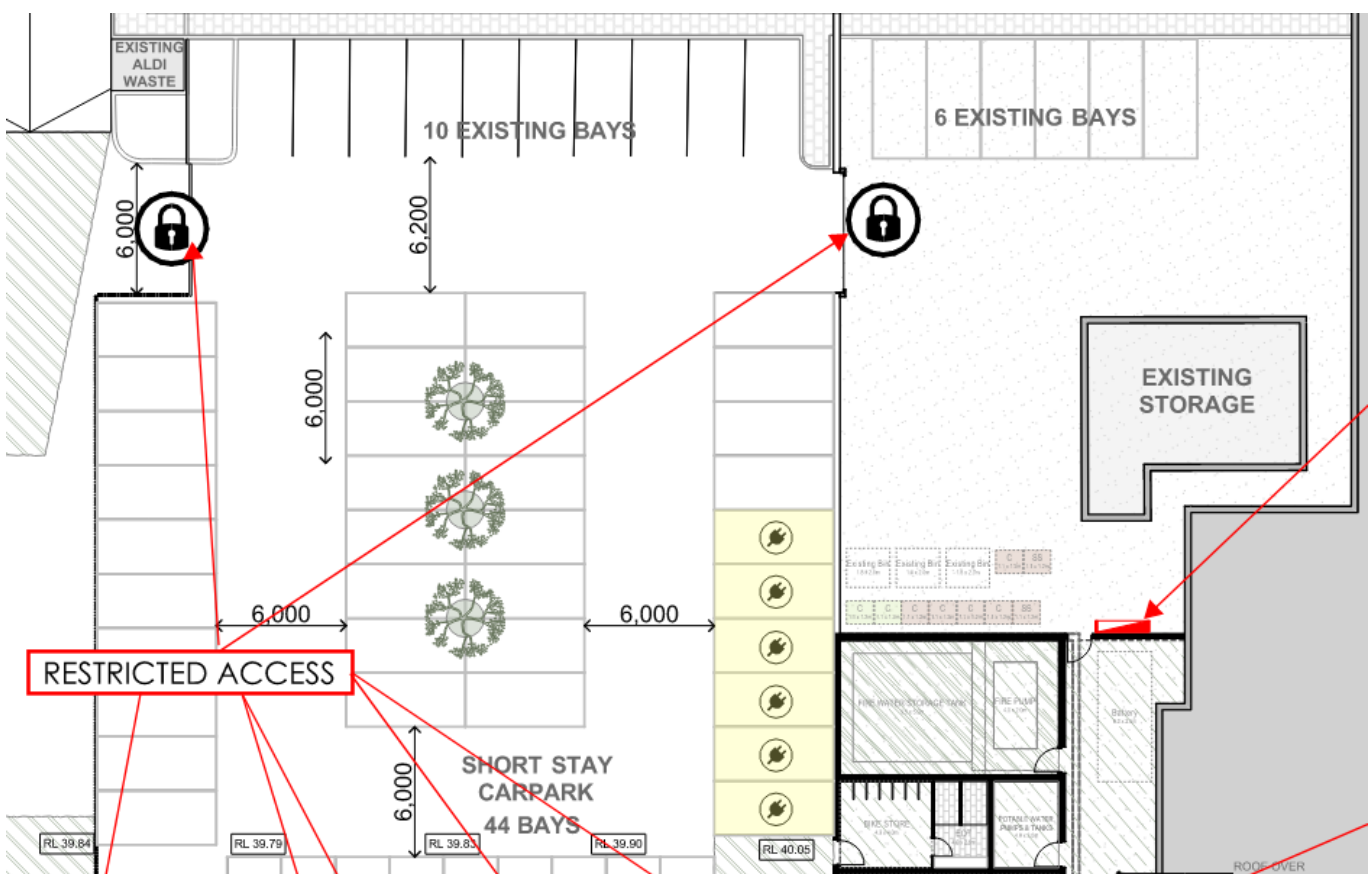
Ground Floor plan of the proposed development showing preliminary EV charging facilities, highlighted yellow.
